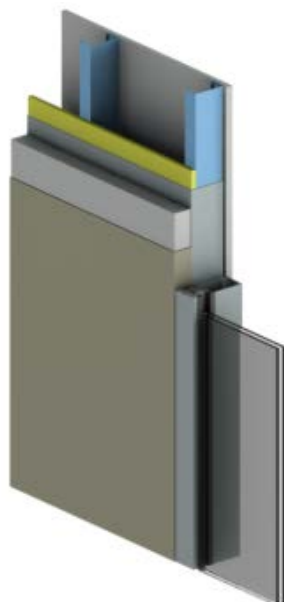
Fully Exterior Insulated EIFS Steel Stud Wall to Curtain Wall Transition
